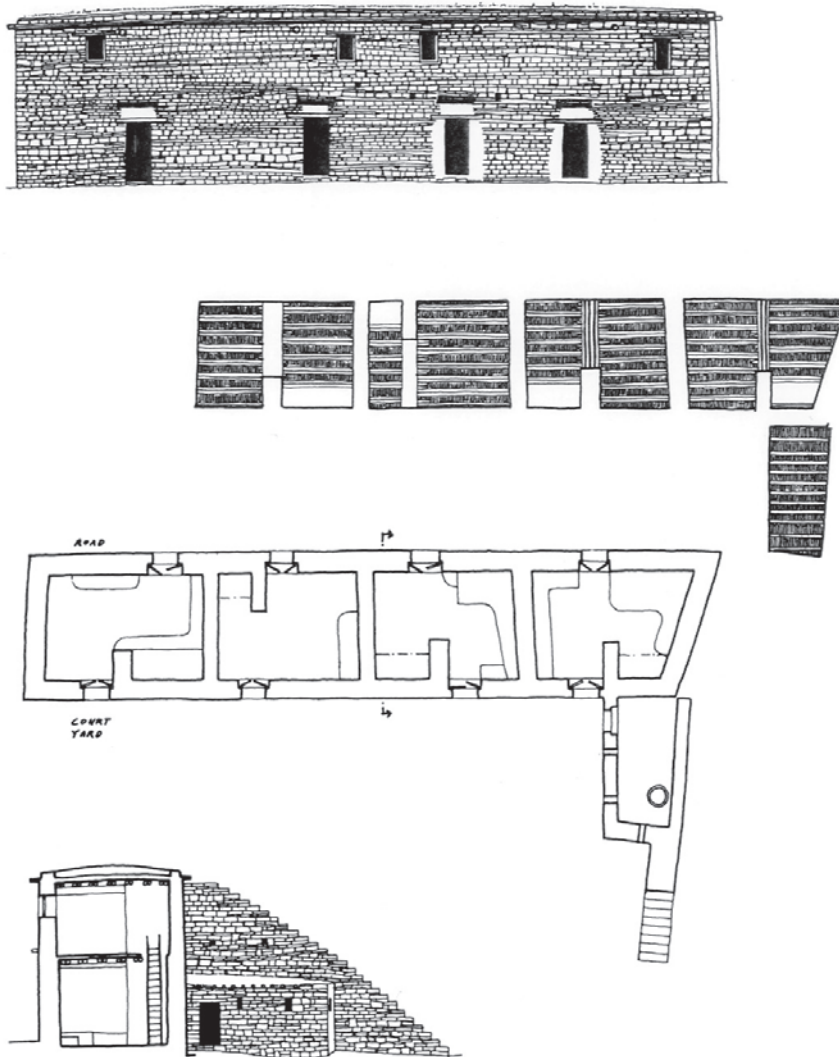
Elevation, ceiling plan, 1F plan, and section of a double story rowhouse type building
